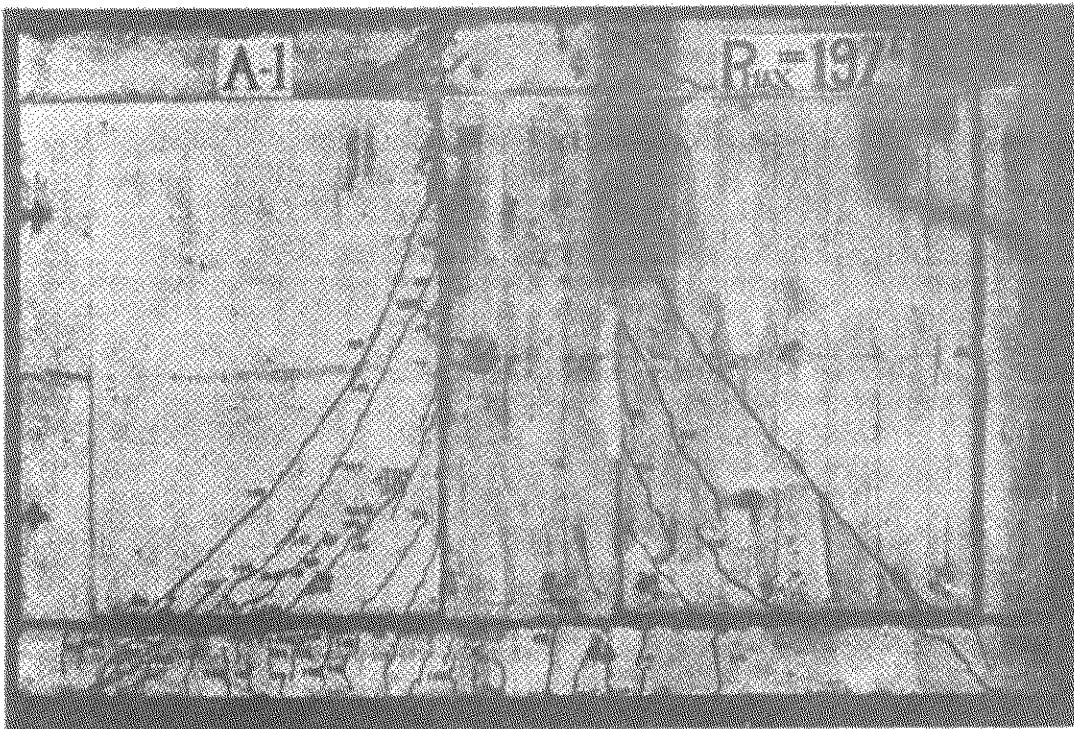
Experimental Crack Pattern for Shear Wall-Frame System A-1
